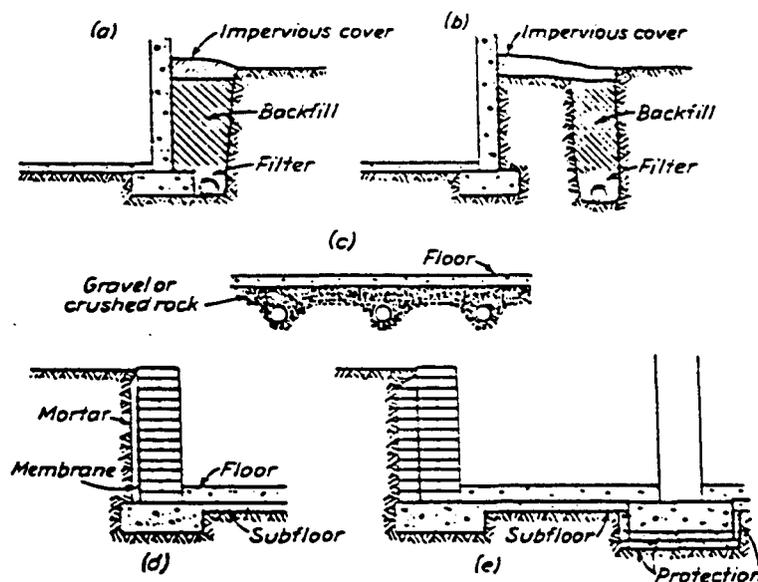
Methods of draining and waterproofing basements. (a) Footing drain. (b) Intercepting drain. (c) Floor drain. (d) Membrane waterproofing where exterior wall is accessible from outside. (e) Membrane waterproofing where outside of wall is not accessible (after Huntington, 1963).
